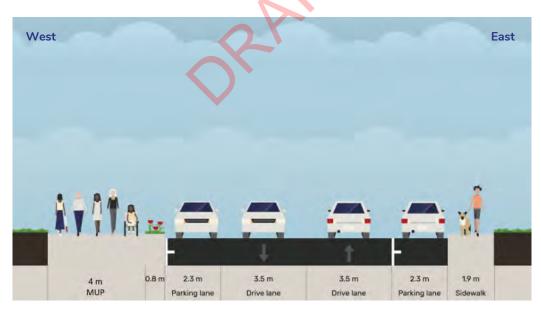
Recommended 4<sup>th</sup> Street Cross-Section Between C Avenue and B Avenue
